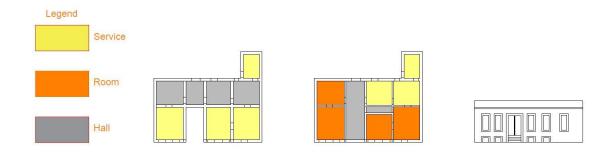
The base sample of the single-story İzmir Houses with plan type 2
